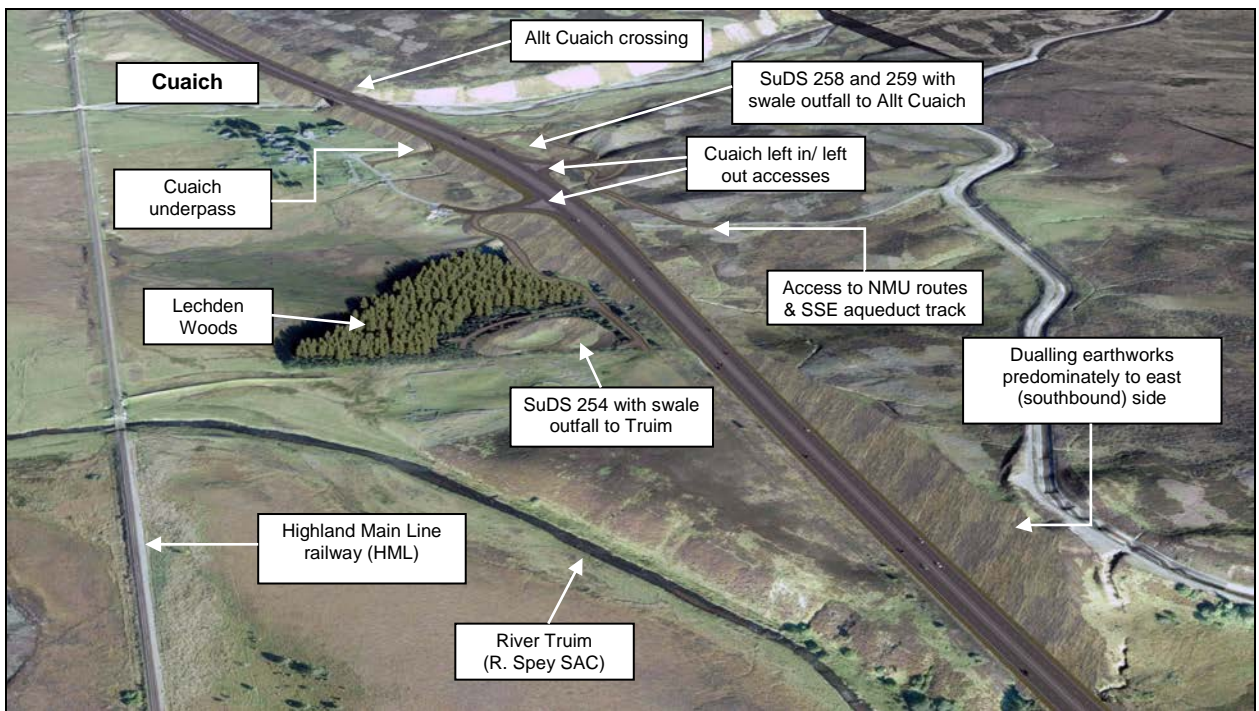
Southbound dualling, SuDS at Lechden, Cuaich access and Allt Cuaich crossing
